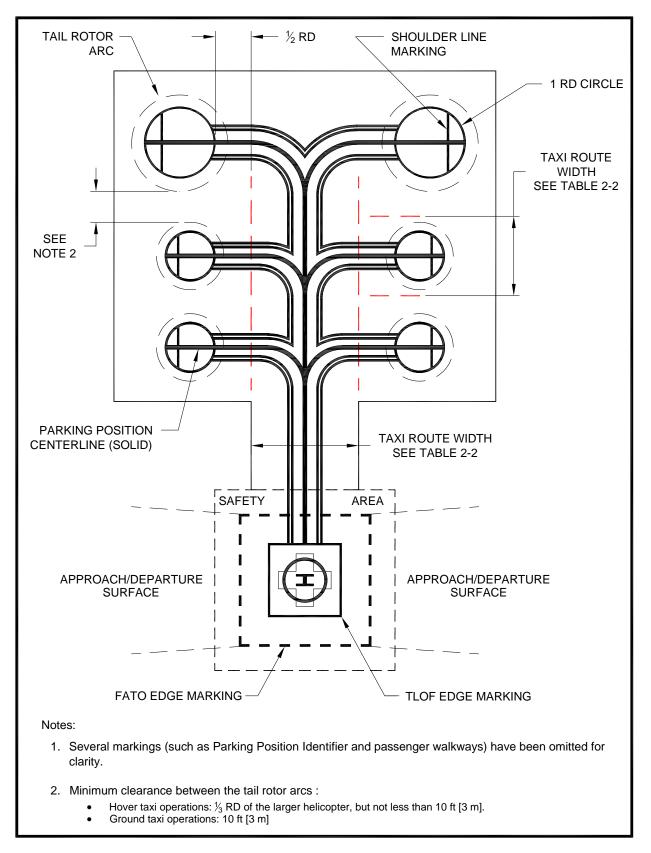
Parking Area Design – "Back-out" Parking Positions: Hospital
